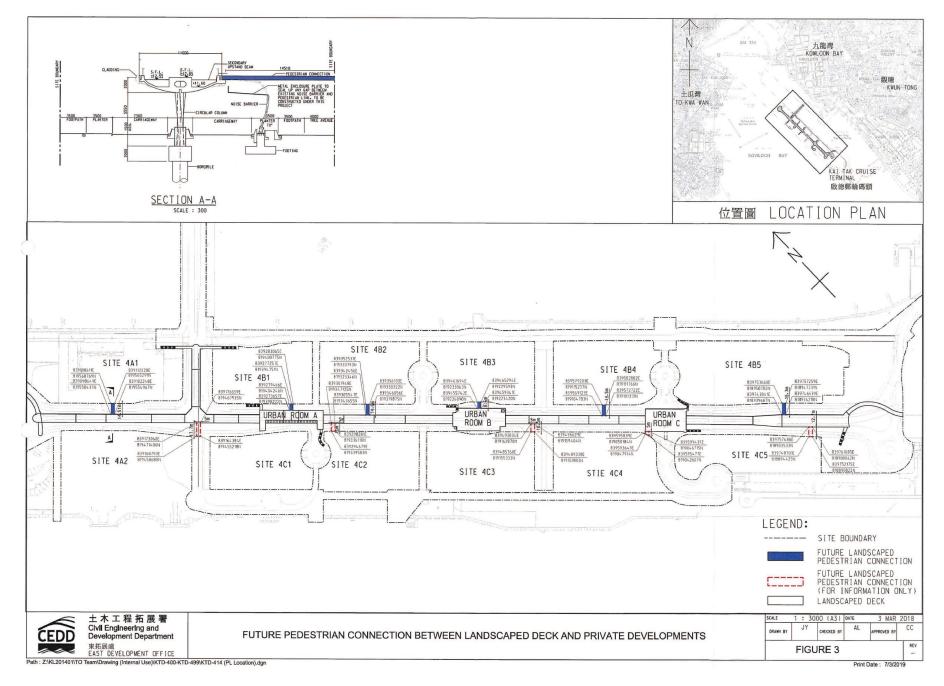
Future Pedestrian Connection Between Landscaped Deck And Private Developments
